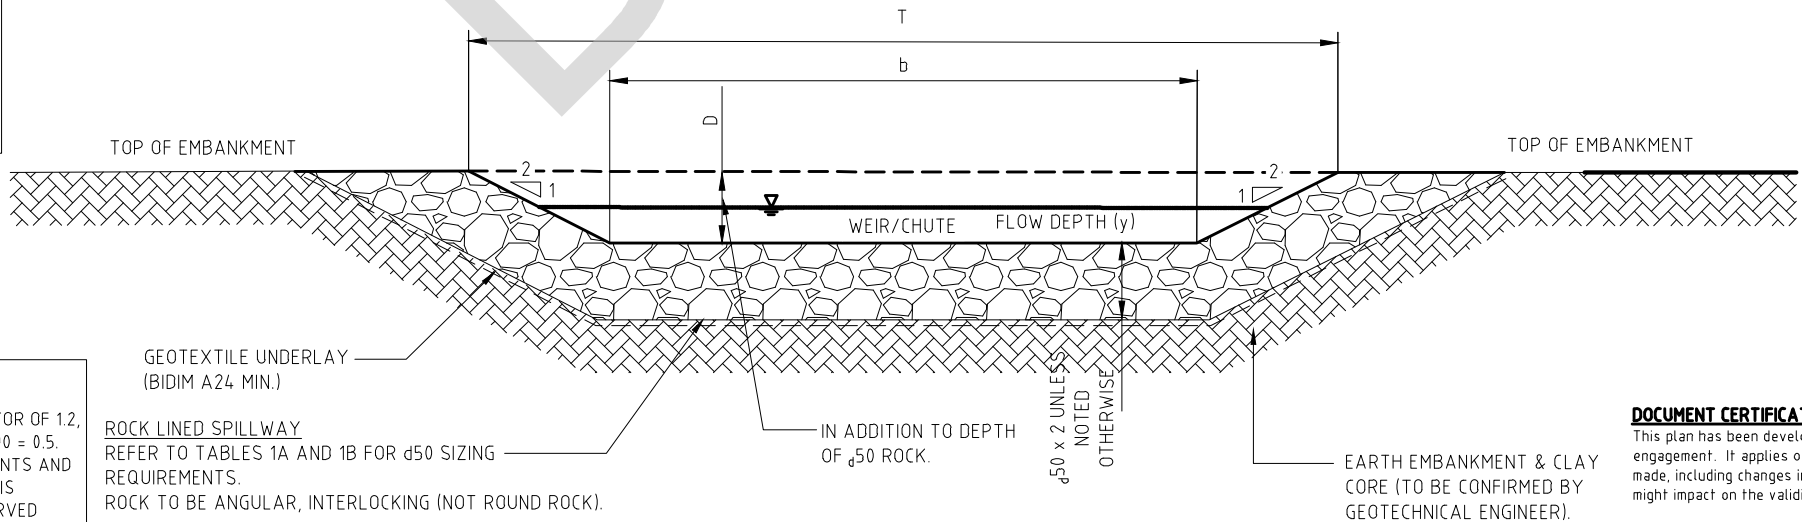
TYPICAL PROFILE OF TRAPEZOIDAL SPILLWAY AND CHUTE.
